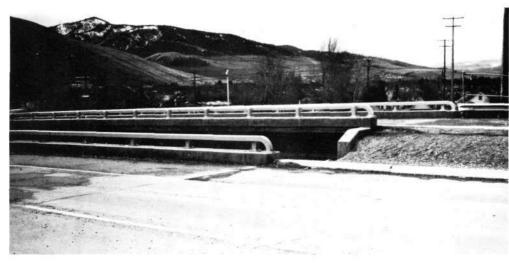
At this dual bridge, where the transition from guardrail to bridge railing has been largely ignored, the bridge rail is quite low, no more than 27 inches above the roadway.
